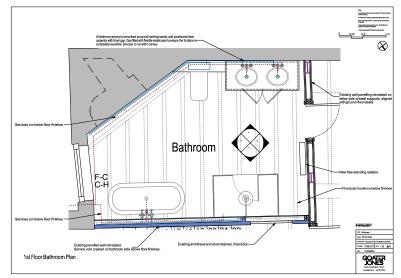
Approved Drawing of floor plan to 1st floor bathroom in Room F4 from application to 09/0292/DD01 (2018) by Goater Jones Architects showing service wall to stairwell
